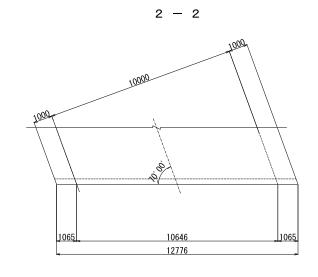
DETAILED DRAWING PLAN OF WATER STOP SCALE=1:20
